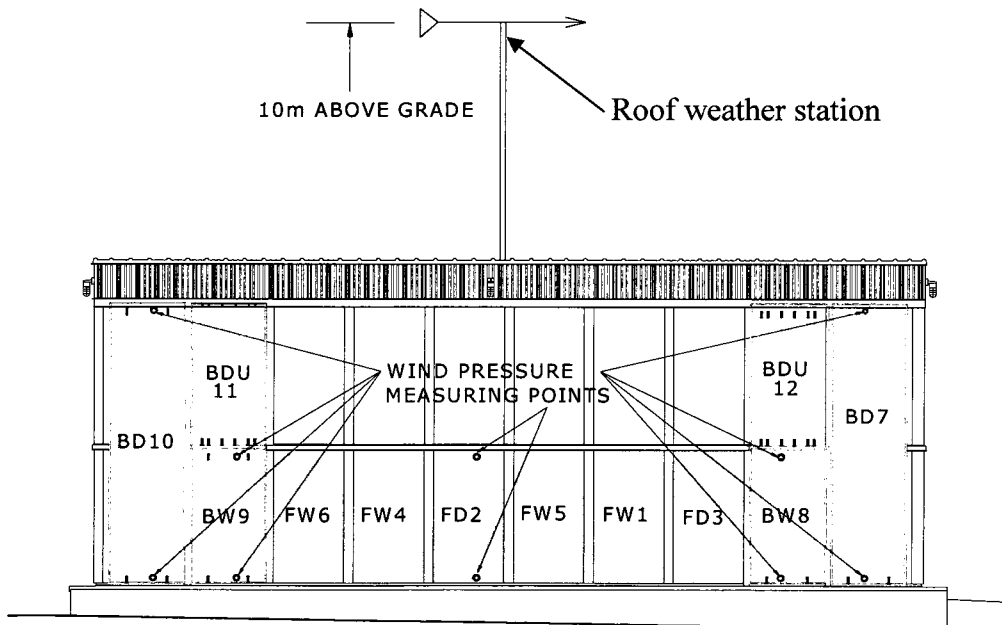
Locations of wind-induced pressure differential measurement points on test walls at the SE facade of the test facility.
